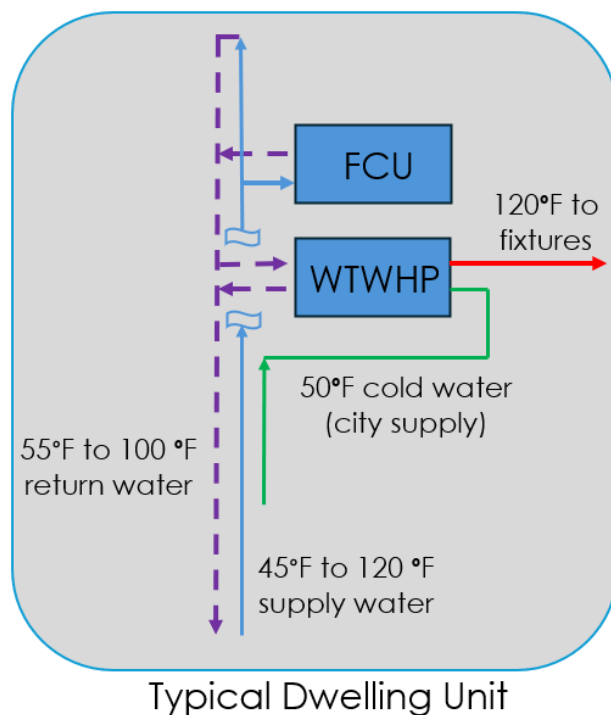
Diagram of dwelling unit piping with water-to-water heat pump
